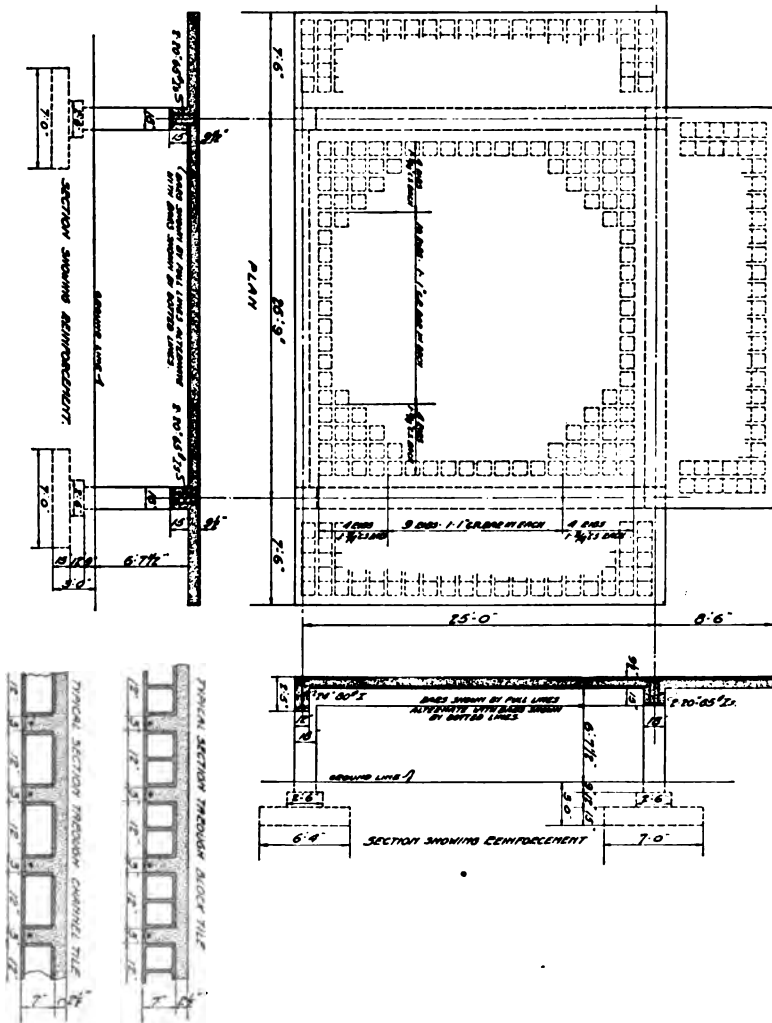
BARR BUILDING TEST PANEL, ST. LOUIS, MO.
